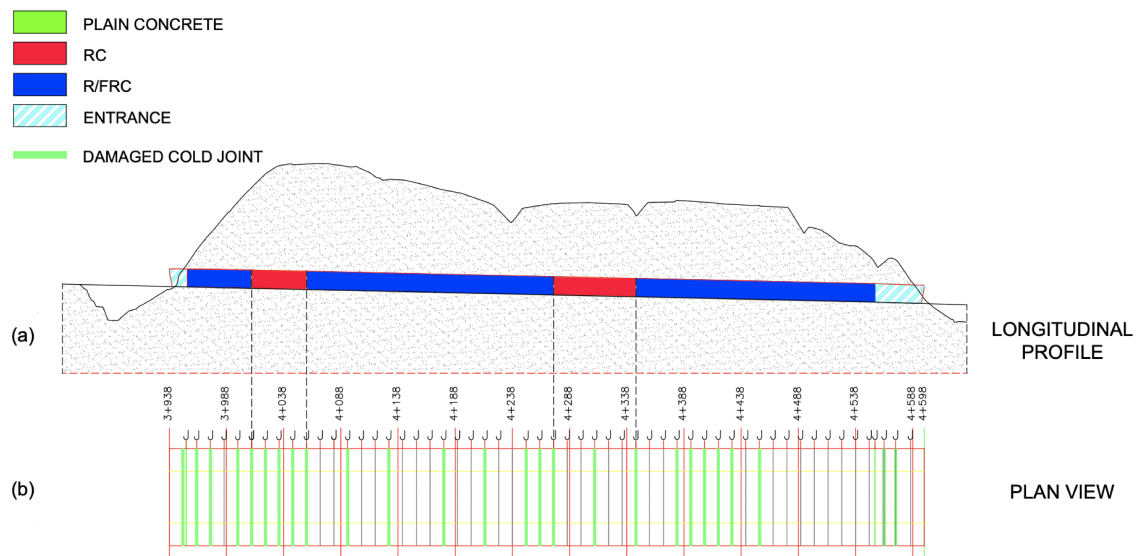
Tunnel #2: (a) longitudinal profile with the type of resisting cross-section; (b) plan view of the panels with the cold joints.
